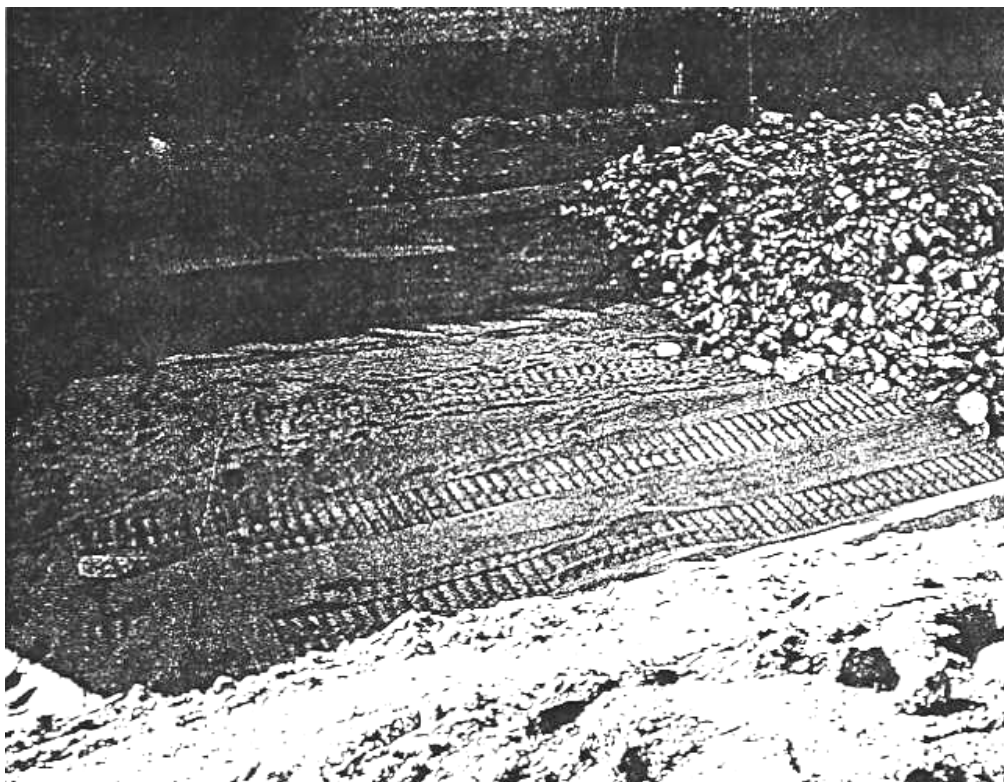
Photograph showing granular and concrete rubble fill being placed in the wall footprint prior to construction of the wall.
